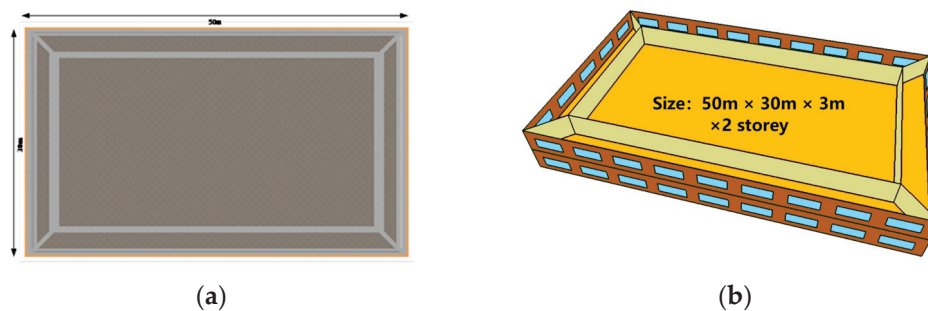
General building energy consumption simulation building model plan structure diagram. (a) Plan view; (b) Section view.
